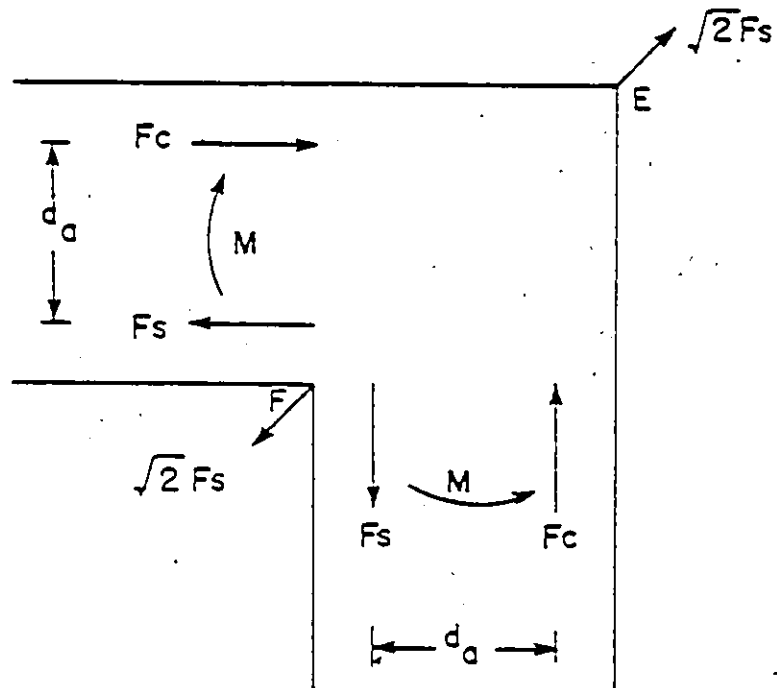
OPENING CORNER AT DIAGONAL CRACKING
